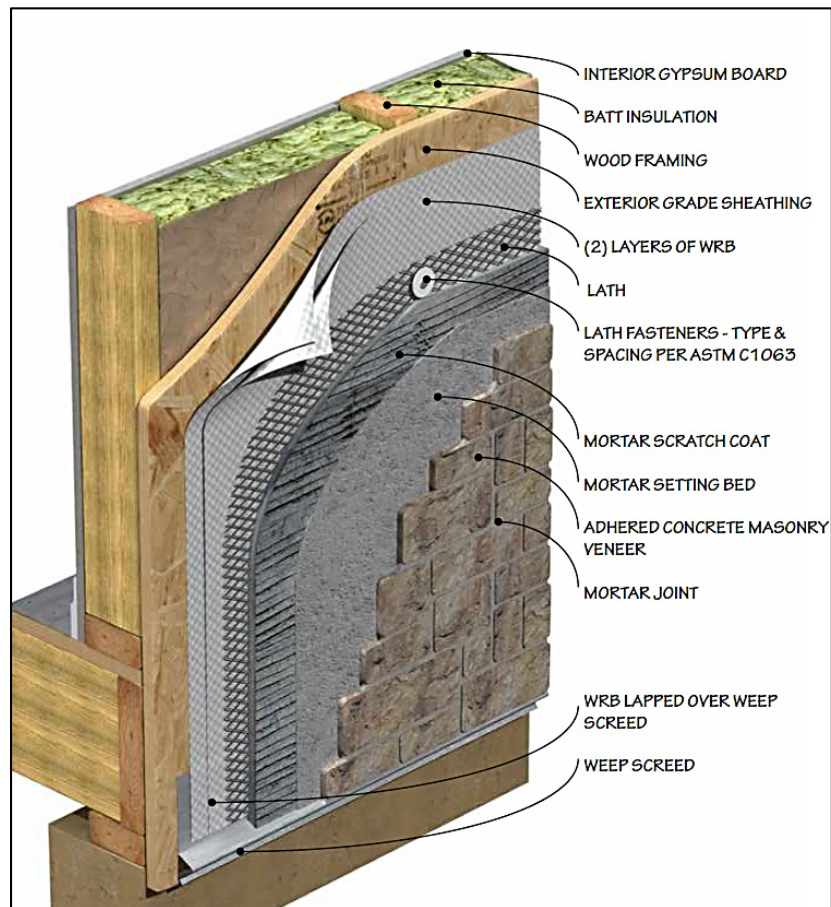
Isometric of a Jointed AMVWS on Wood Framing [6]
